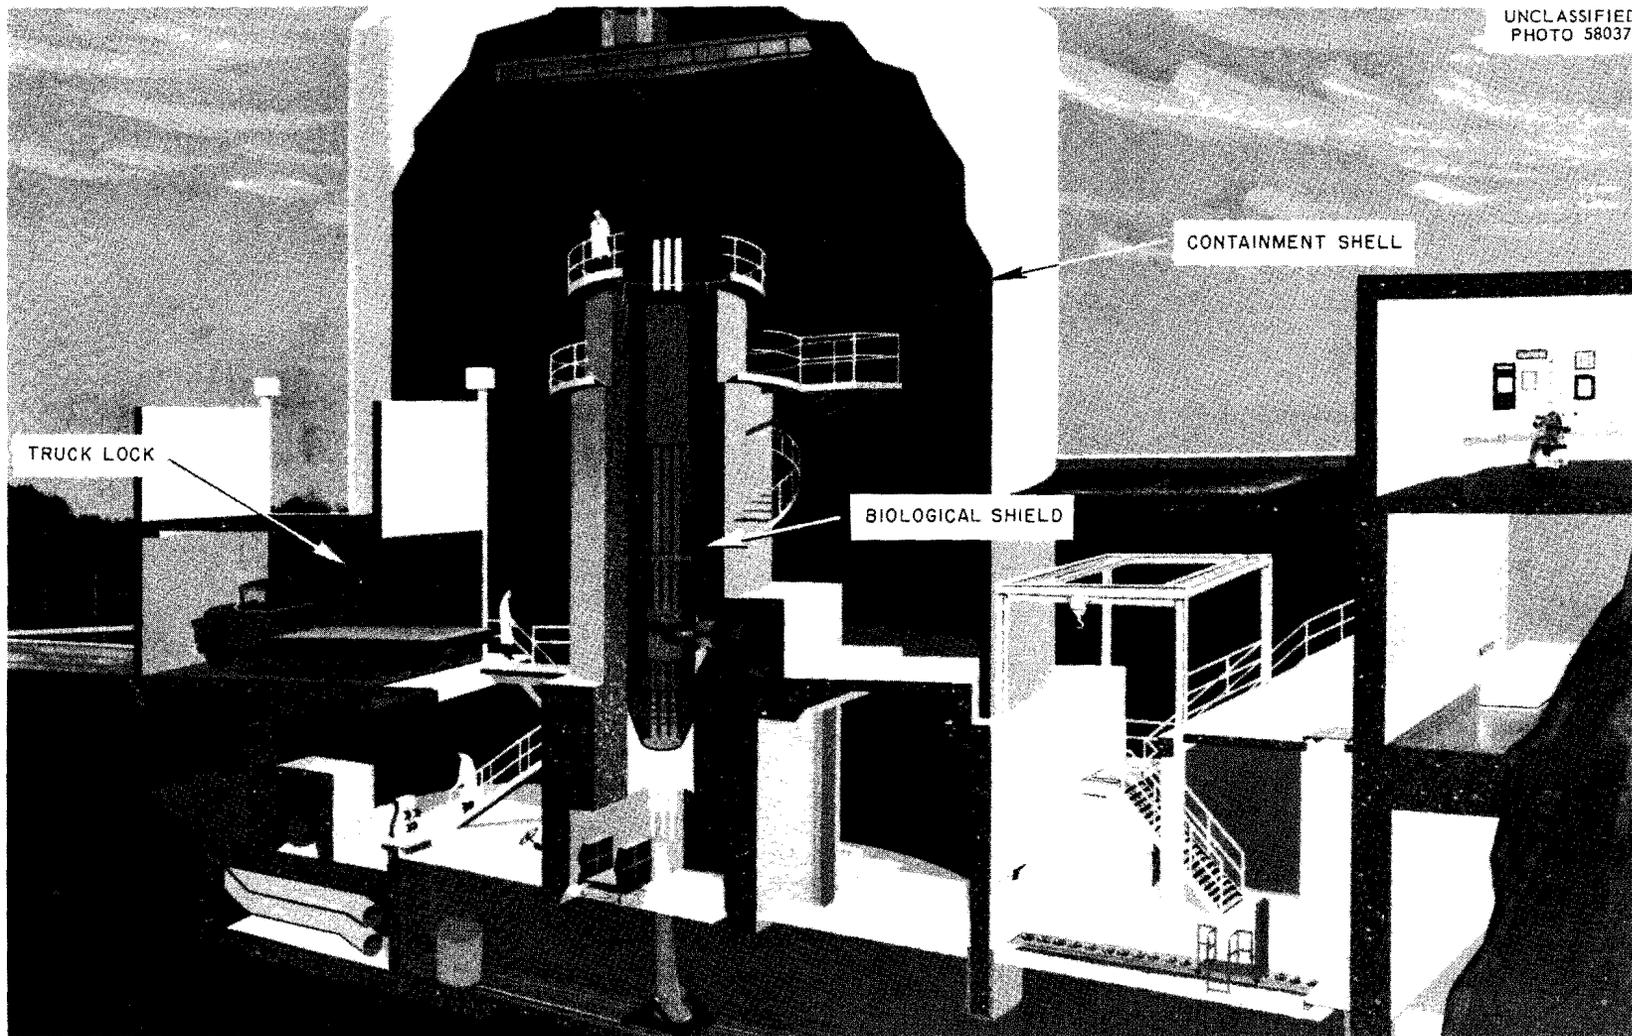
Cutaway View of Westinghouse Testing Reactor Shield and Containment Shell.
